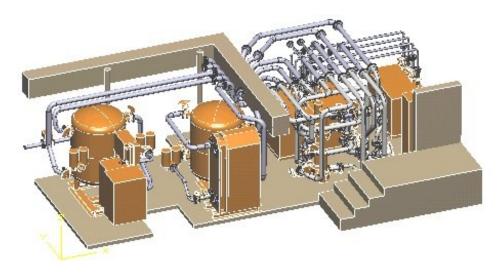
3D CAD drawing of heat pump energy plant design In the last phase of the project the plant was de-assembled, shipped to Cardiff and assembled on site (figure 6).
